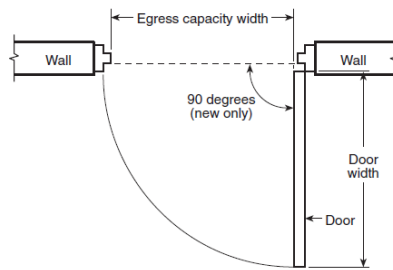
(a) Door Width — Egress Capacity.
